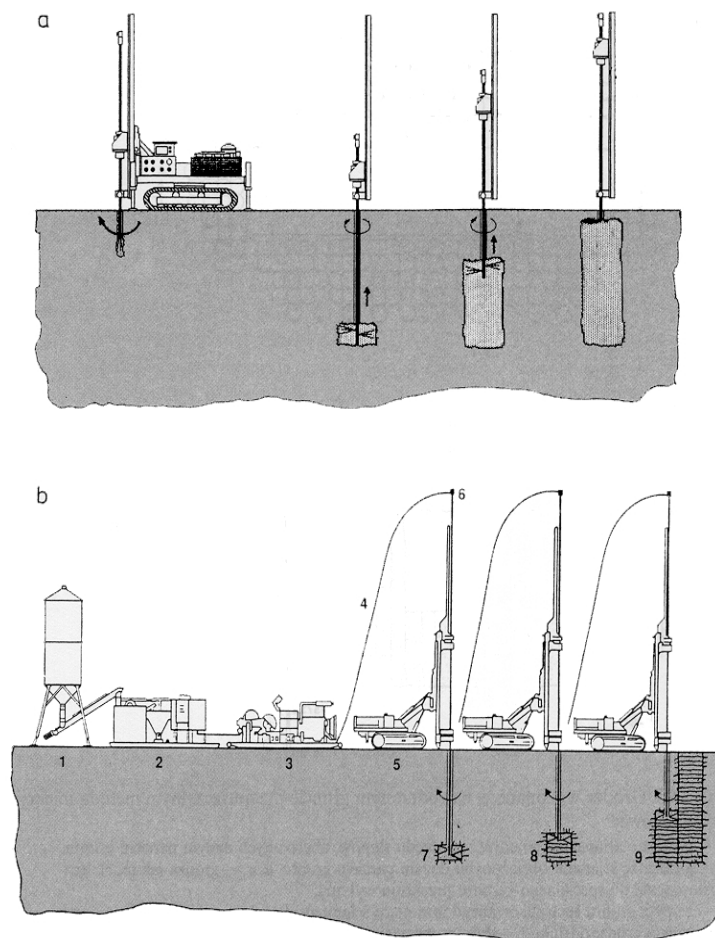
Stages of conducting jet-grouting method (a) as well as set of the equipment used (b):
